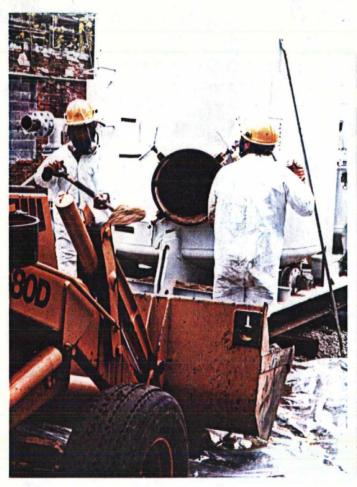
Placing Cover Over New Roof, Tank A-7. 8/29/85
